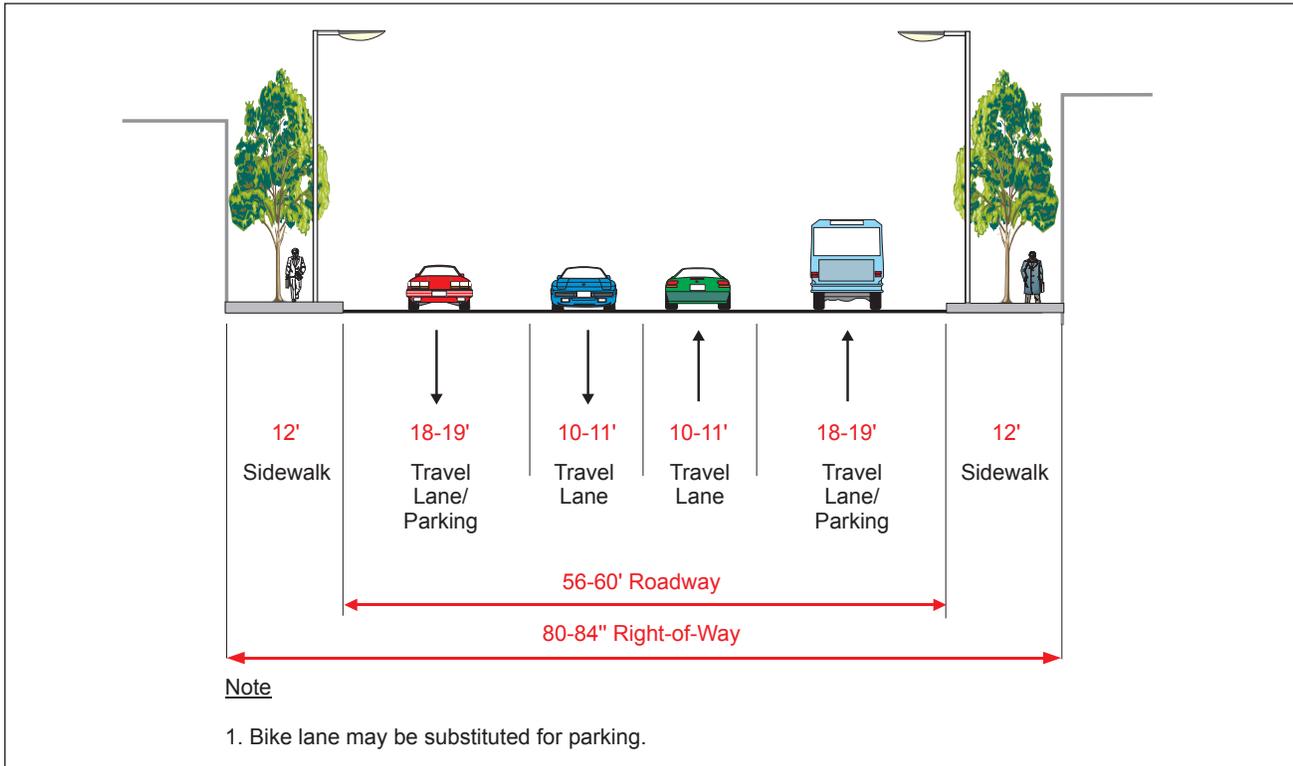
Street Standard Section for Street (Collector) - 4 Lane
